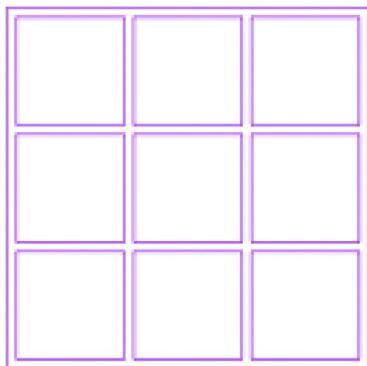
Plan view of the supporting arrangement of the system with continuous concrete strips.
